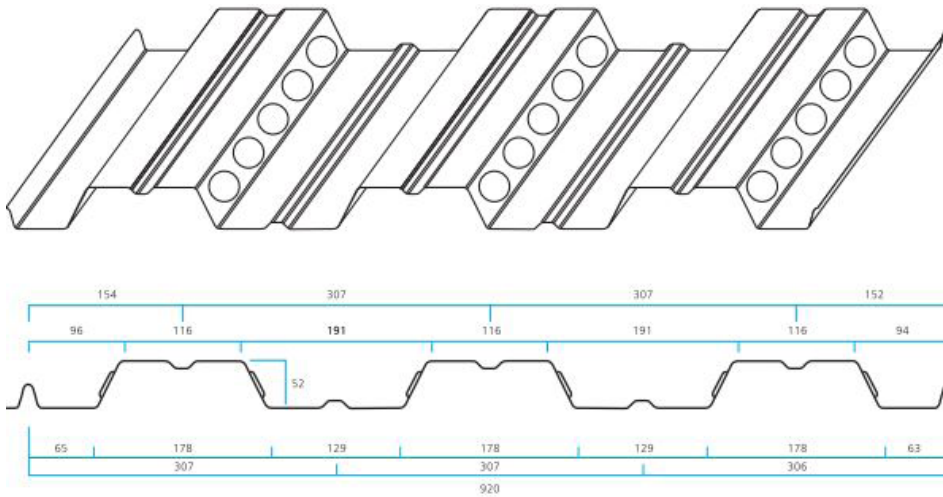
Features of ATAPANEL Composite Flooring Sheet
